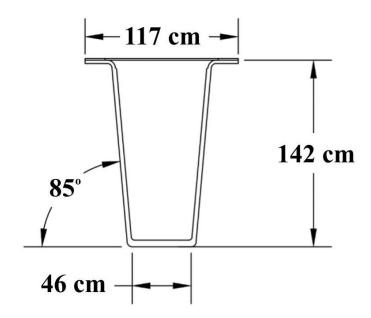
Cross section of the preliminary design for the CT girder from AIT Bridges.
